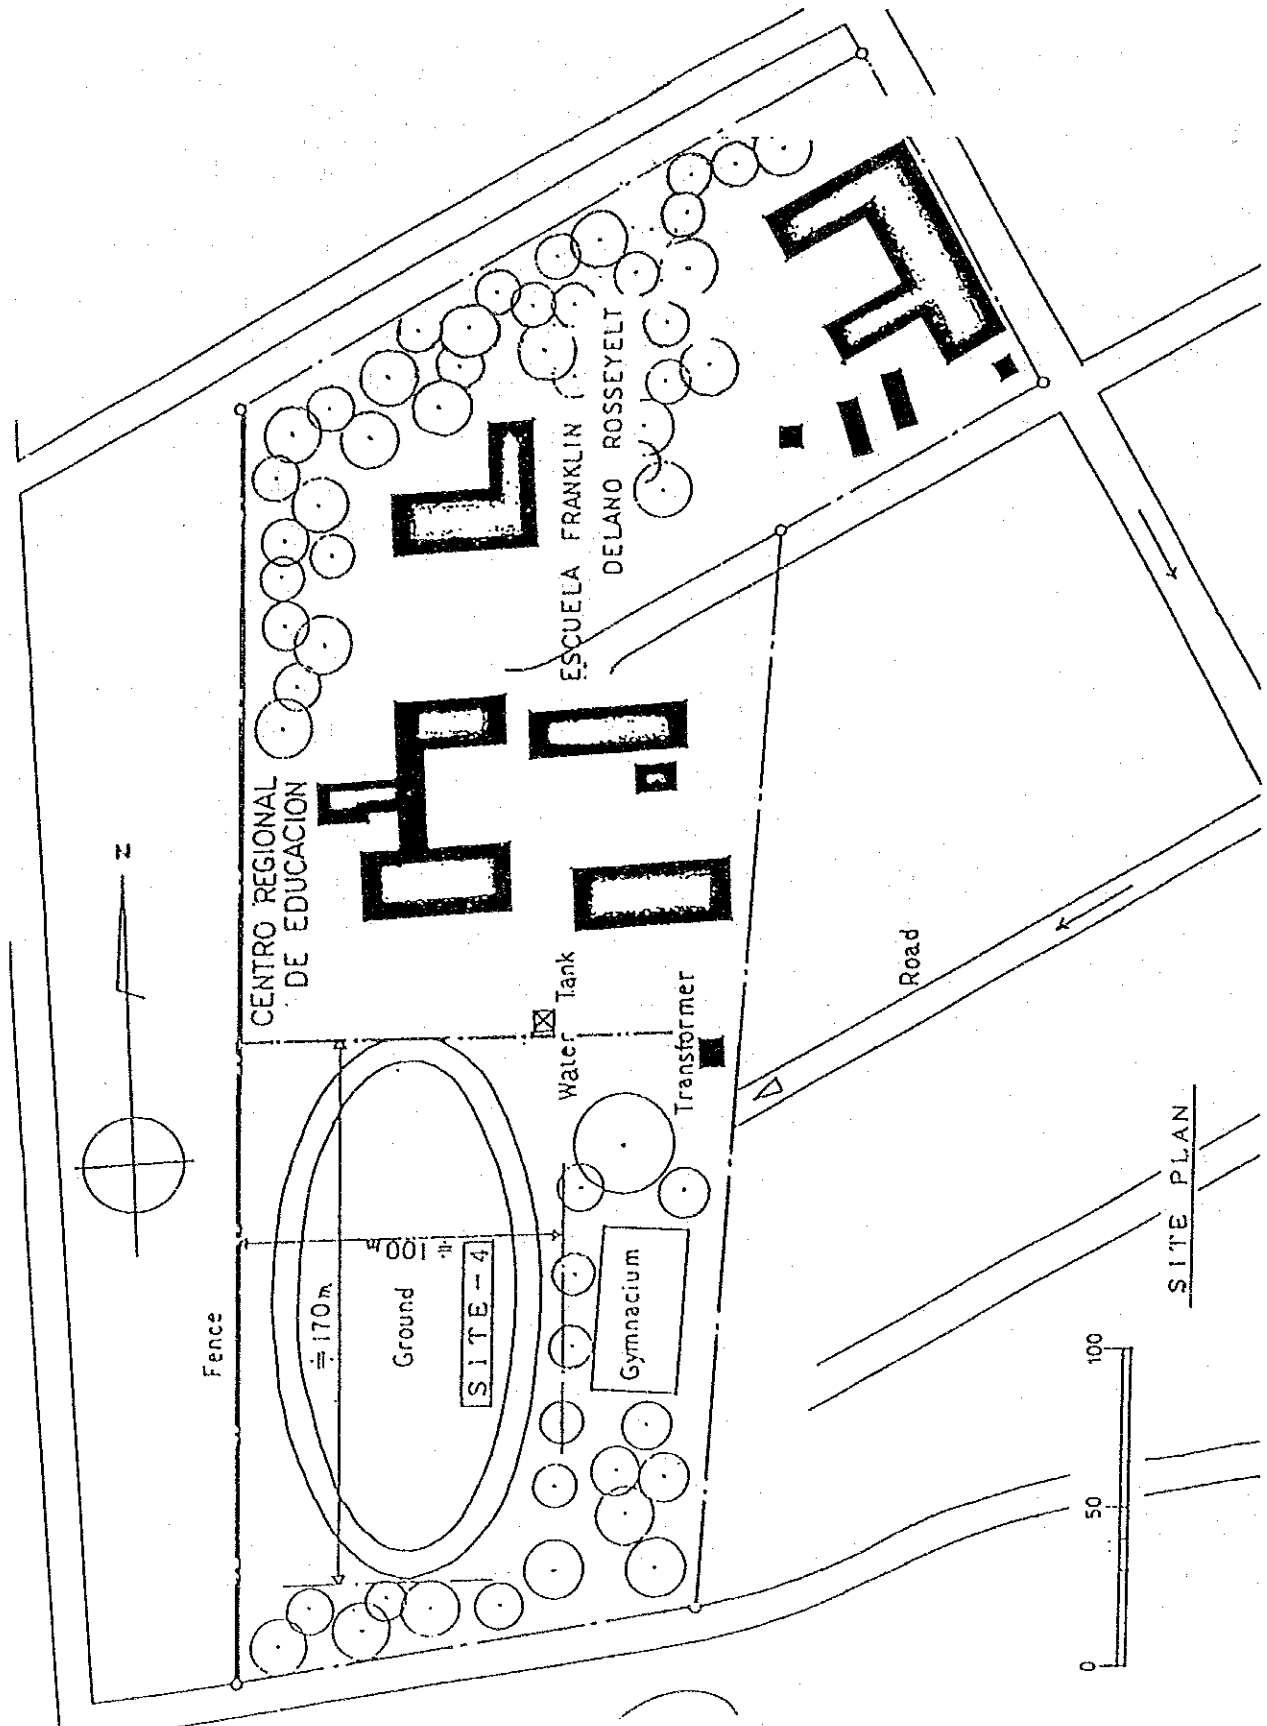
Plan of Site-4 (San lorenzo)
